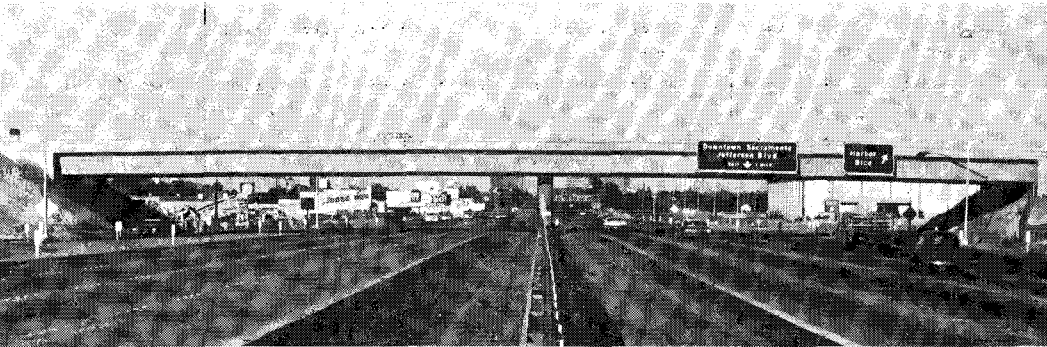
Two-span replacement with same length from abutment to abutment.
